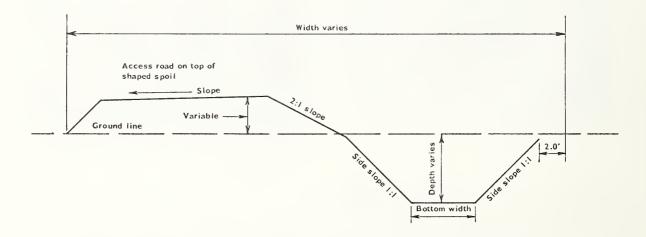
Typical Main Ditch Cross-Section Showing Basis For Determining Right-Of-Way Width
